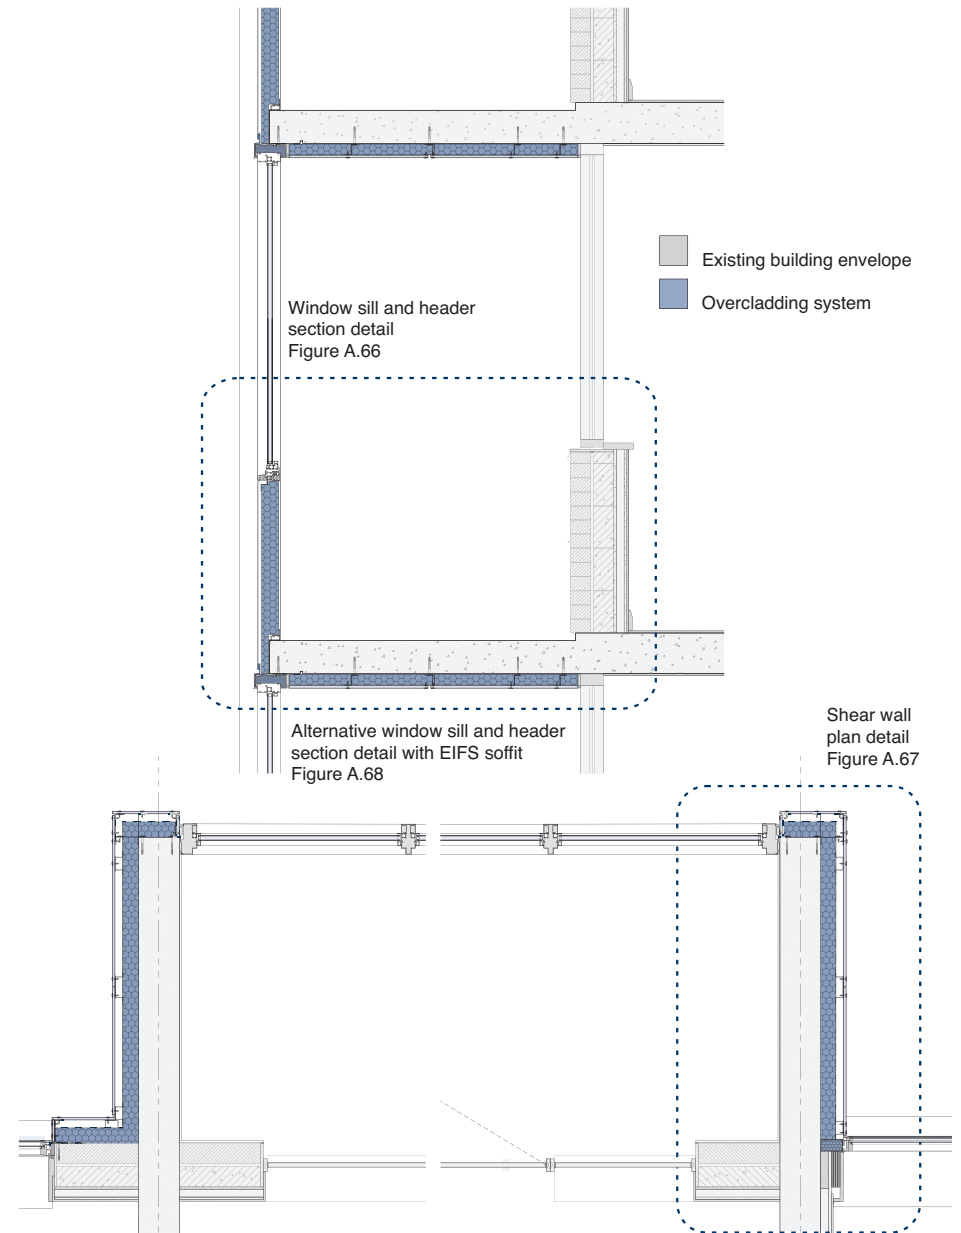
Section and plan views of a balcony enclosure assembly with corresponding detail drawings denoted.
